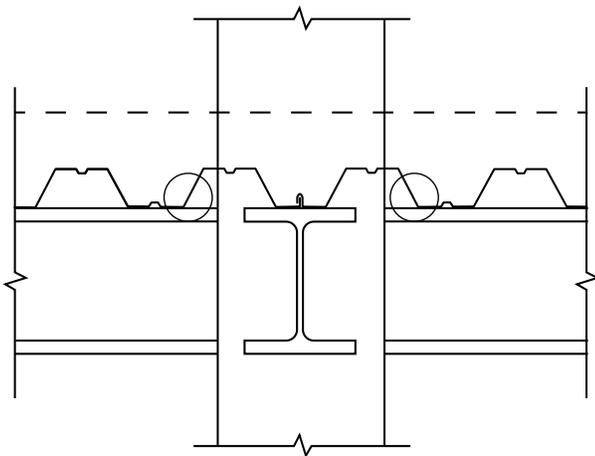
COLUMN DETAIL NOT REQUIRING DECK SUPPORT ANGLES
